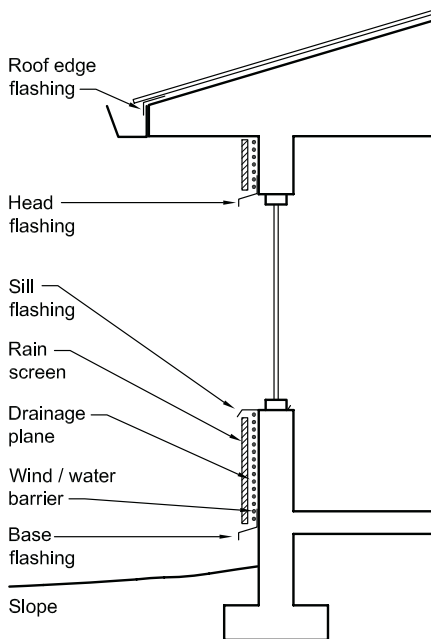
Always have a positive way to drain bulk water. Use drainage planes to keep water from entering and flashing to drain it back out if it gets behind the wind/water barrier.
